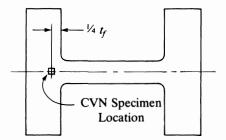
Location from which charpy impact specimen shall be taken. American Institute of Steel Construction
